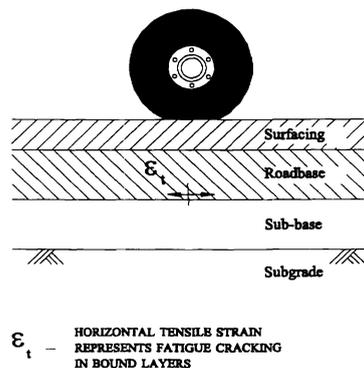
, Section through a thinner asphalt pavement showing mechanism of fatigue cracking
